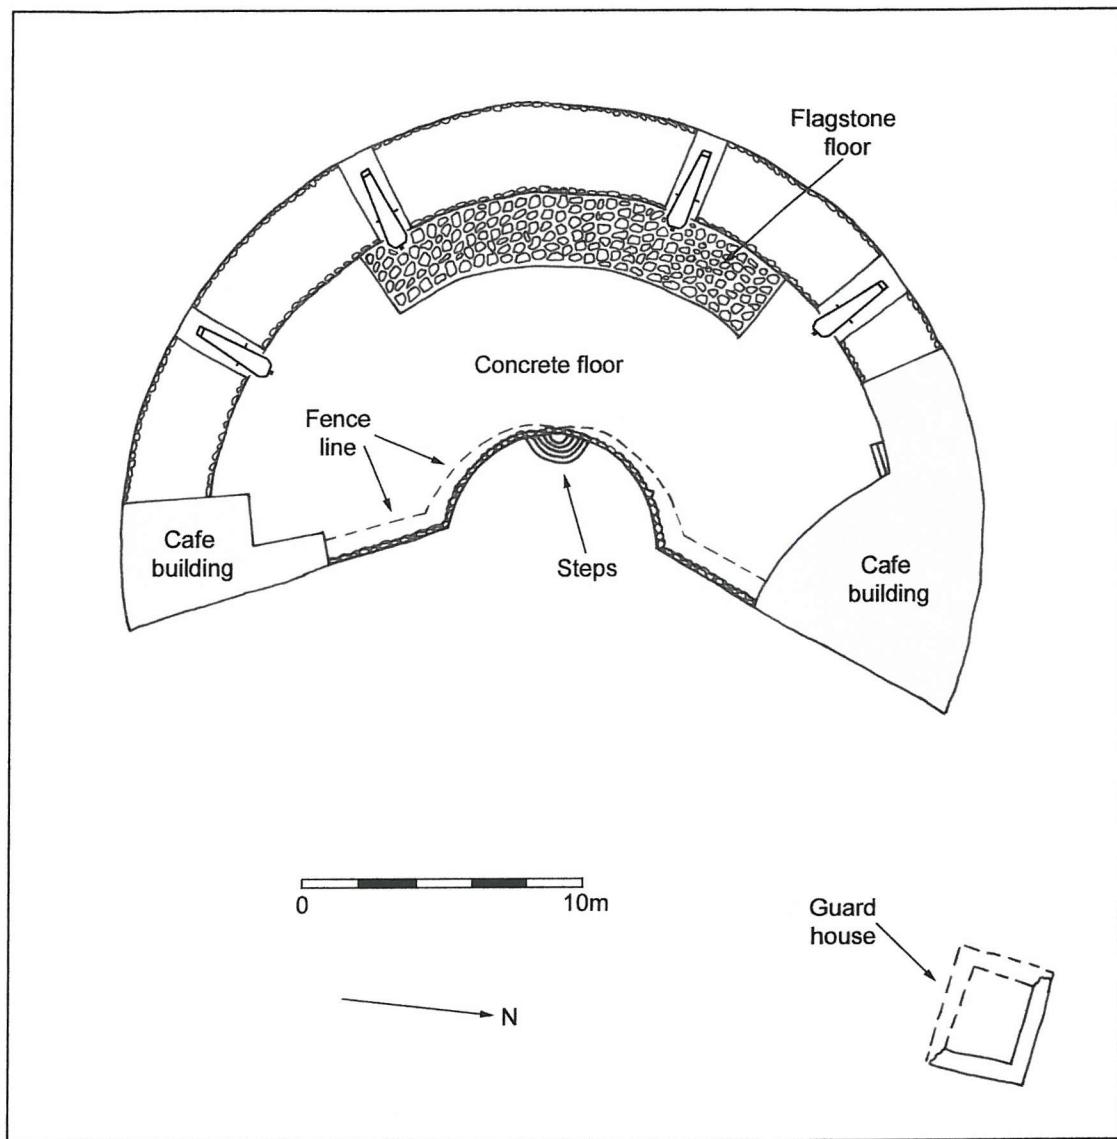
Site plan of Morton's Bay fort (Fort Ashby)
